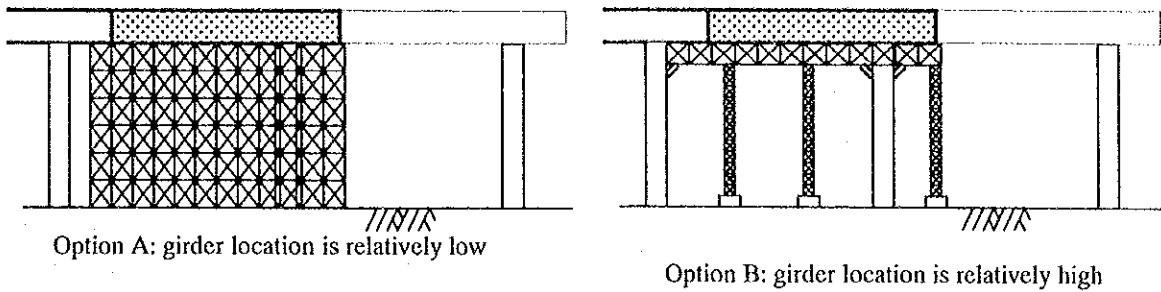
Examples of Construction of PC Box Girder on Staging
